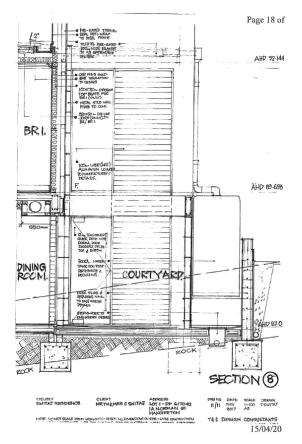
Retaining between proposed dwelling and courtyard of approved dwelling
